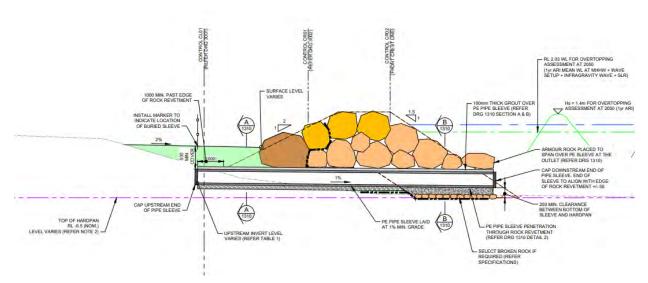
Cross section showing pipe sleeve through rock revetment<sup>31</sup>
